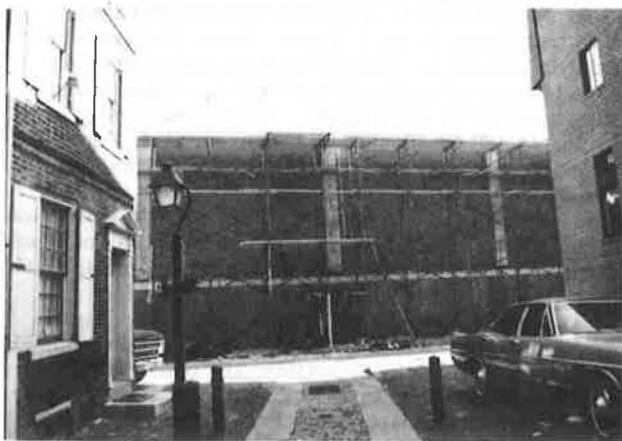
Brick-faced concrete barrier under construction at Elfreth's Alley.
